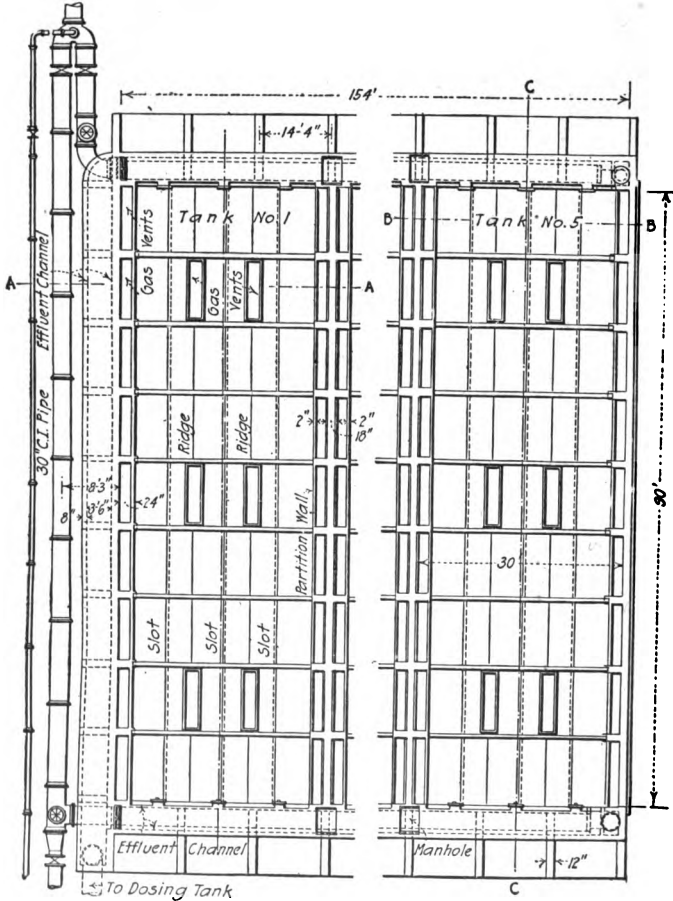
Partial plan of Imhoff tanks, Fitchburg, Mass.
